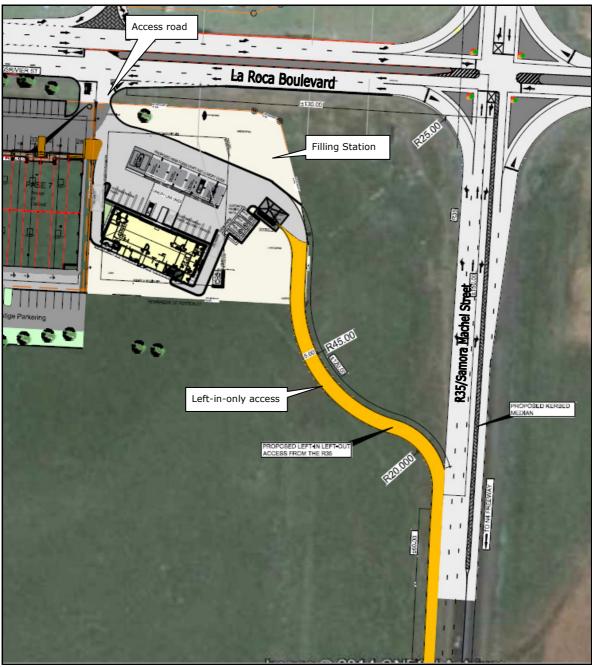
Proposed layout plan of the filling station and access road (taken from Kotze, 2017)
